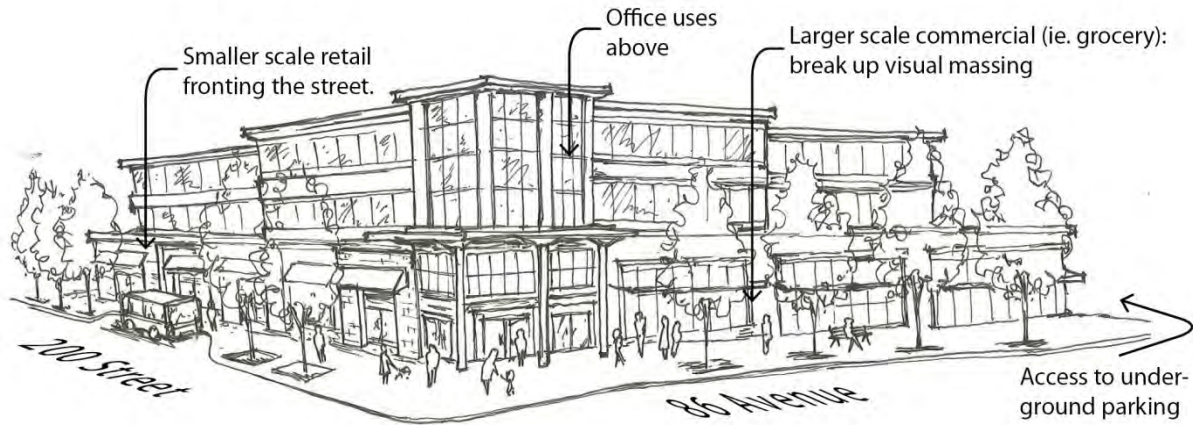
Orient buildings to, and provide direct pedestrian access from, the adjacent public street/sidewalk.
